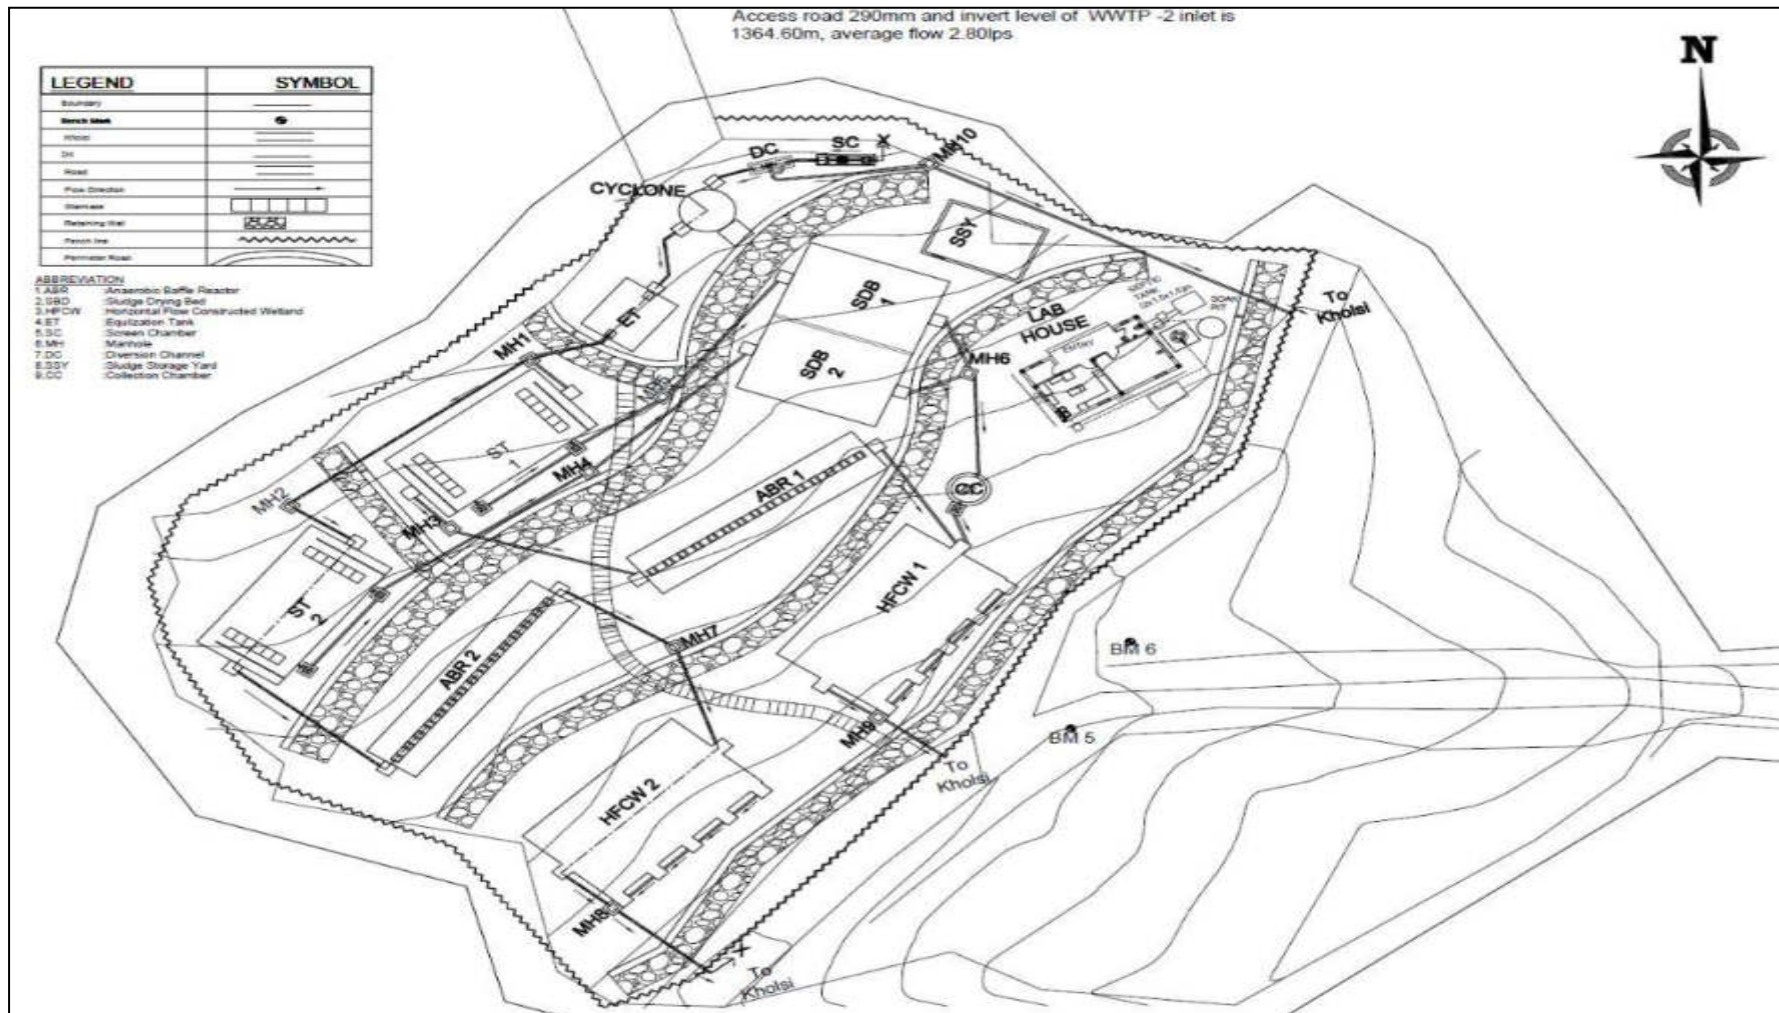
Layout plan of the Proposed WWTP-2 (2.8 lps)
